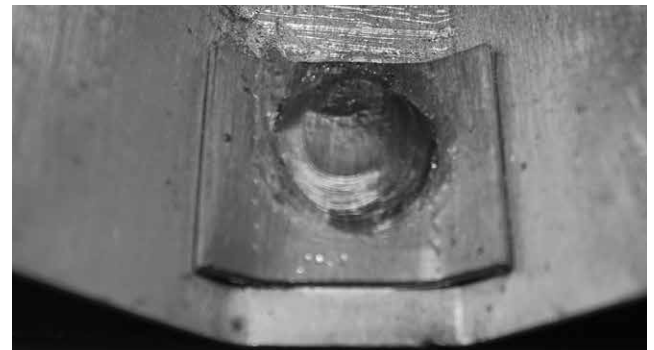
ARC SPOT WELD (weld to support)
